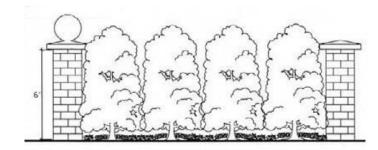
Opaque Screen with Evergreen and Piers
